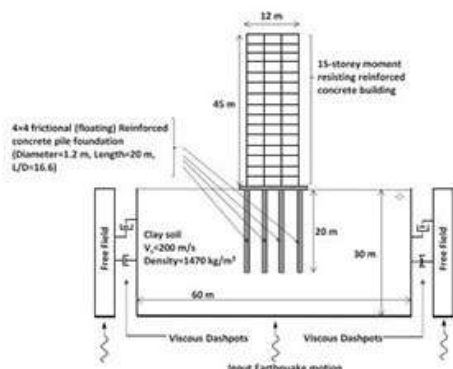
Prototype structure supported by floating (frictional) pile foundation.
